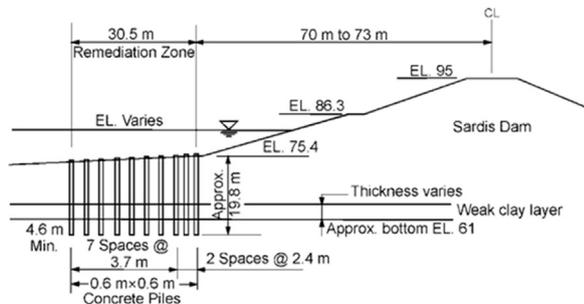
Elevation of pile remediation of Sardis dam [1].
